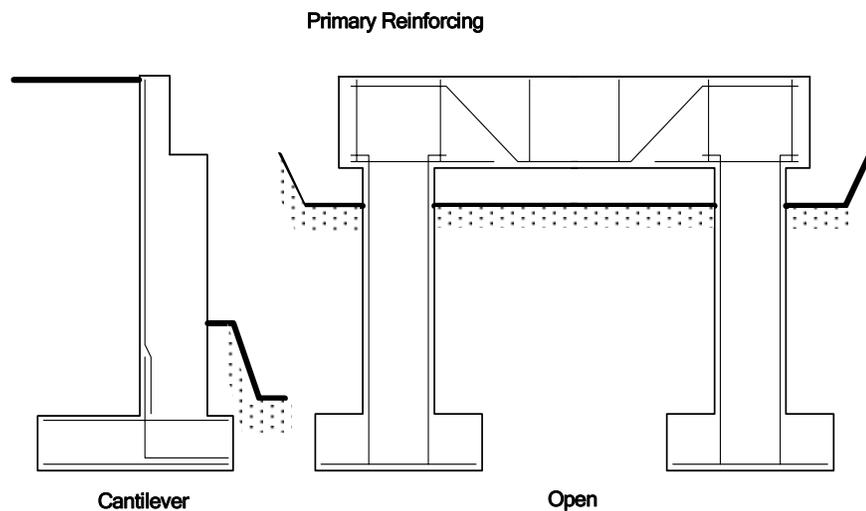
Primary Reinforcement in Concrete Abutments
